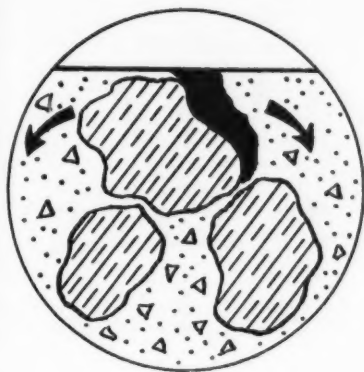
(left)—This shows how a crack may be formed by shrinkage around aggregate.
